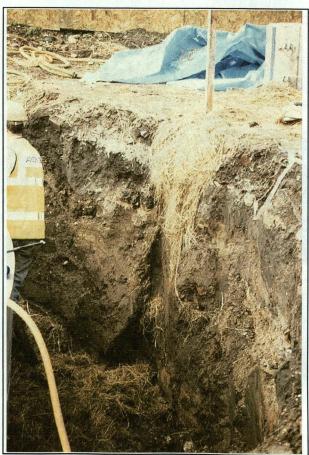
View of revealed deposits, Pumping Station site (Area 1)
